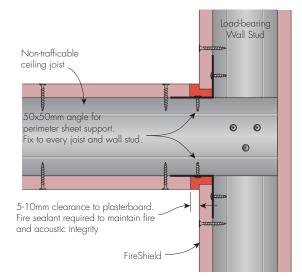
Non-Trafficable Ceiling to Plasterboard Wall
